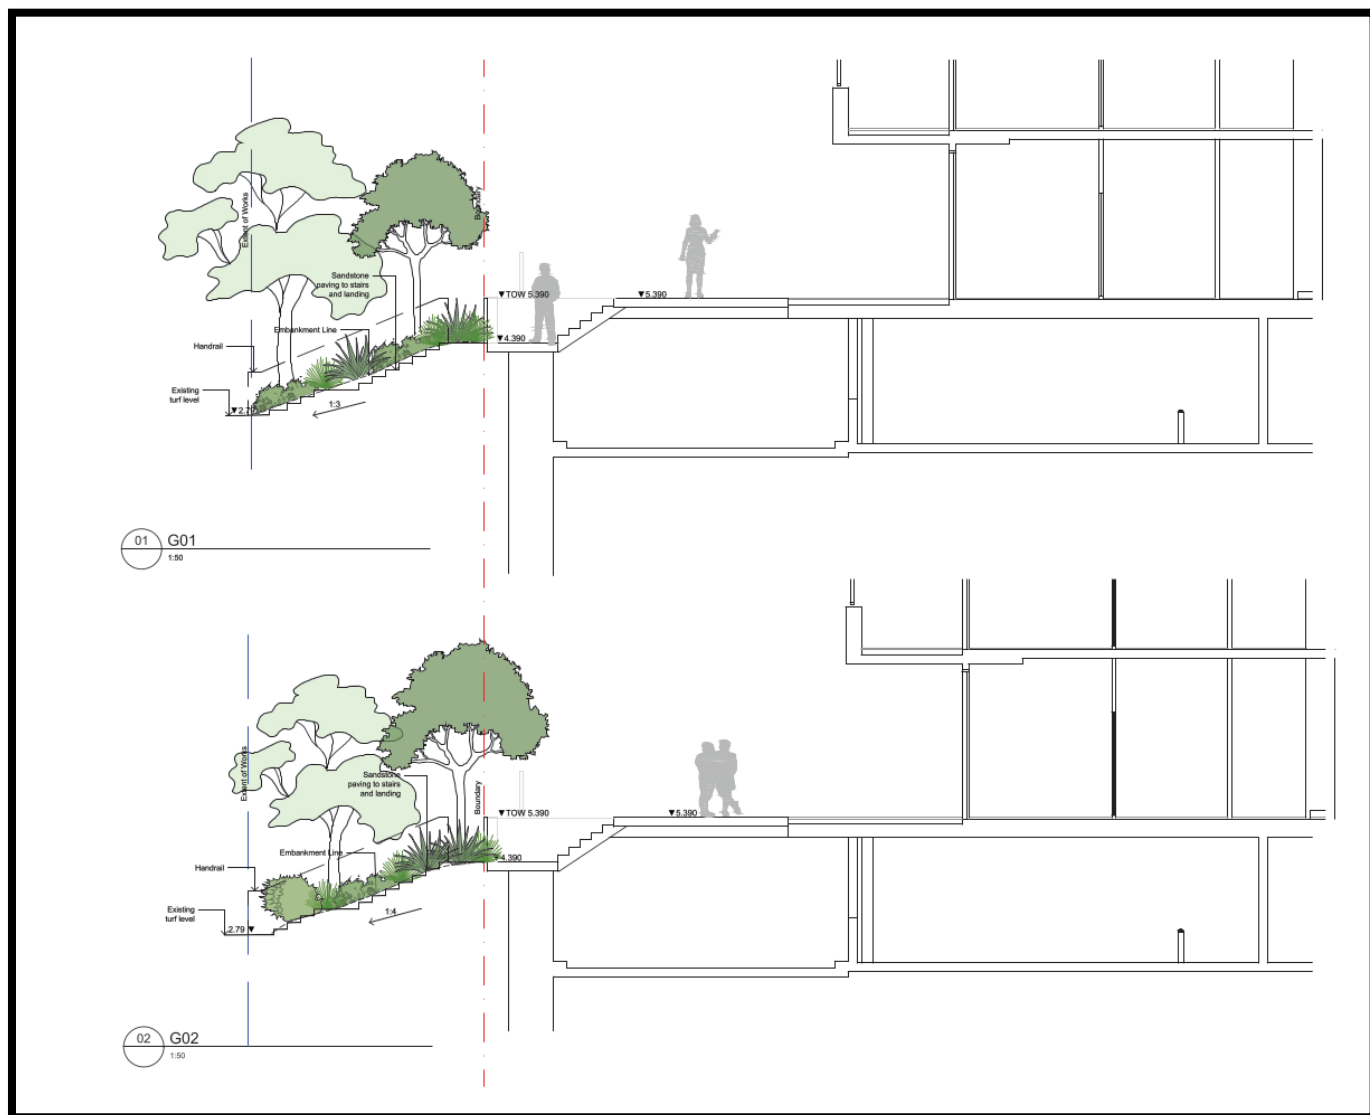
Section detailing pedestrian access for apartments 1 and 2 from public foreshore
